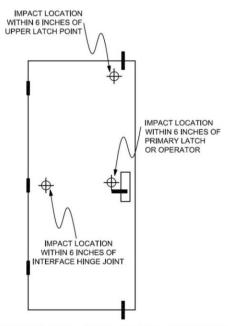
(1) – SINGLE DOOR TEST SPECIMEN
